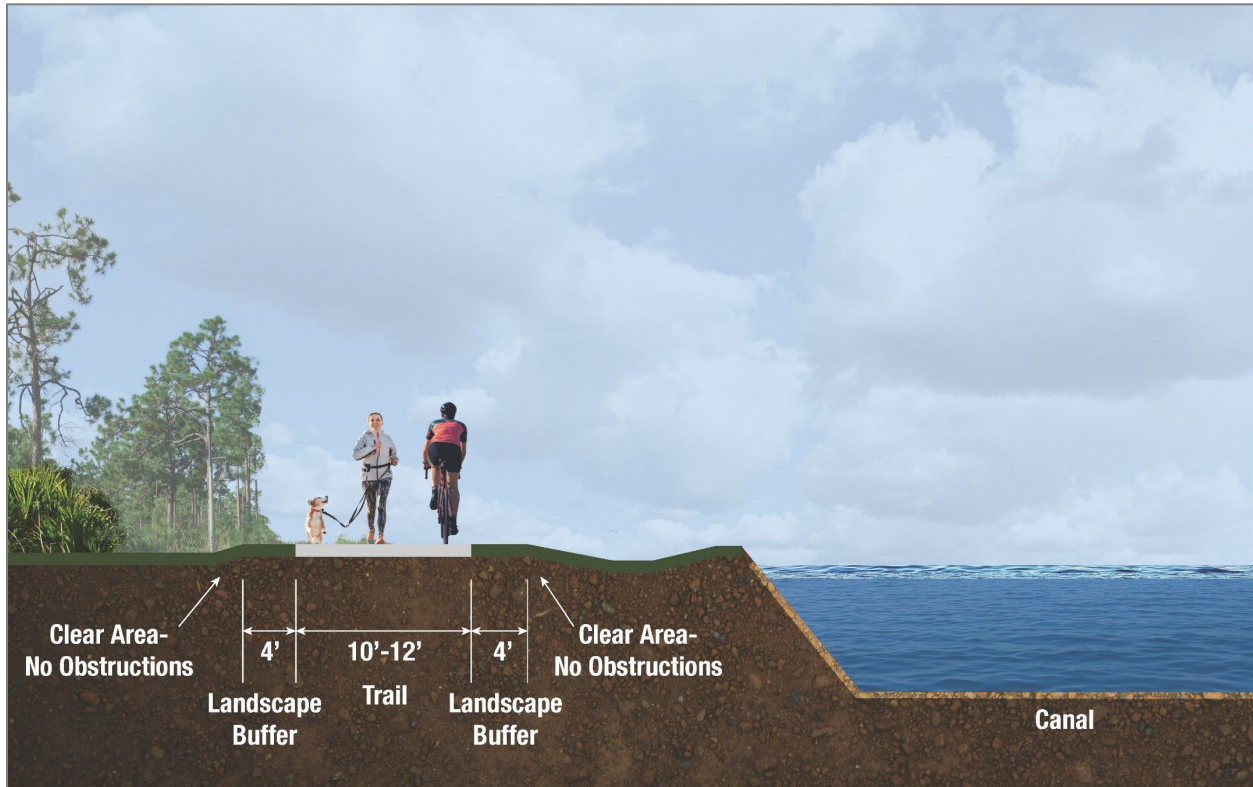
Conceptual Typical Section – Trail Within Utility Corridor
